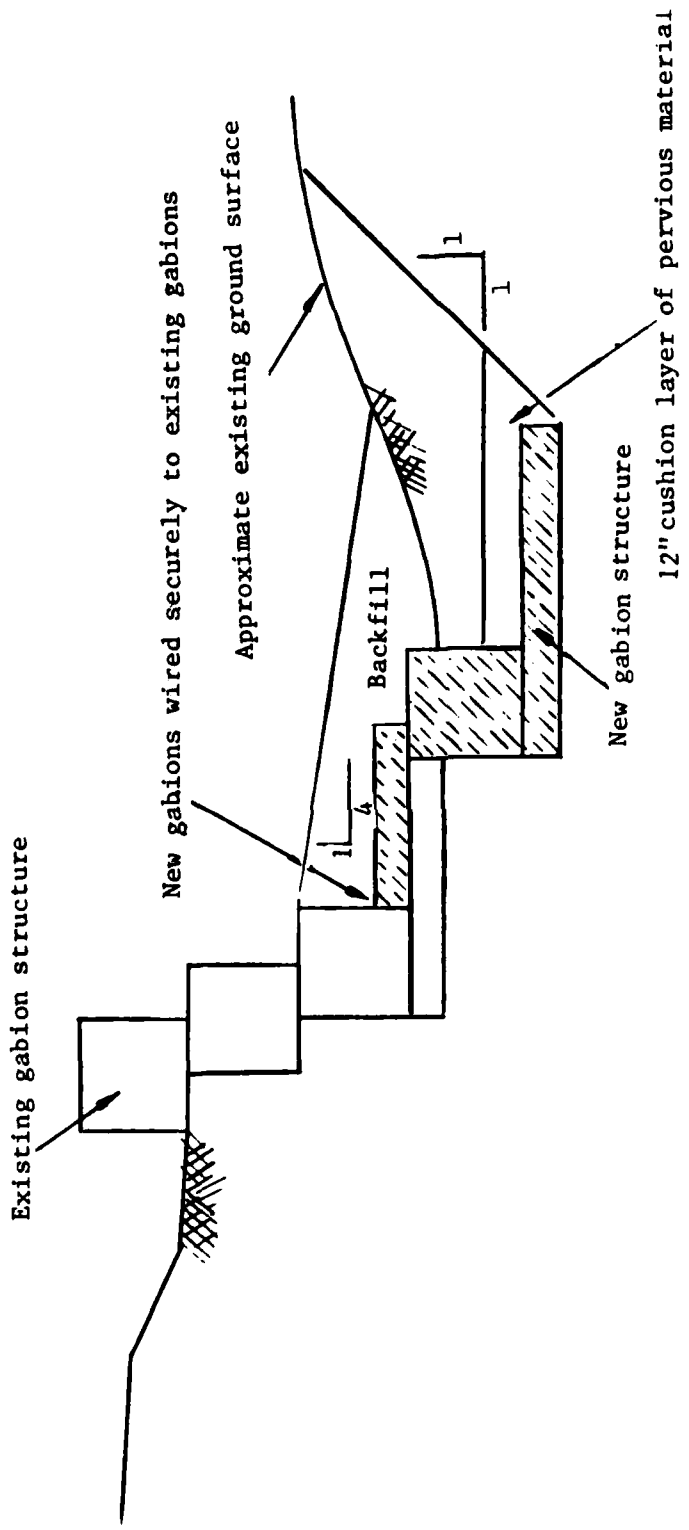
Modification to farthest upstream section of the midfloodway gabion barrier as constructed in September 1978 (paragraph 21)
